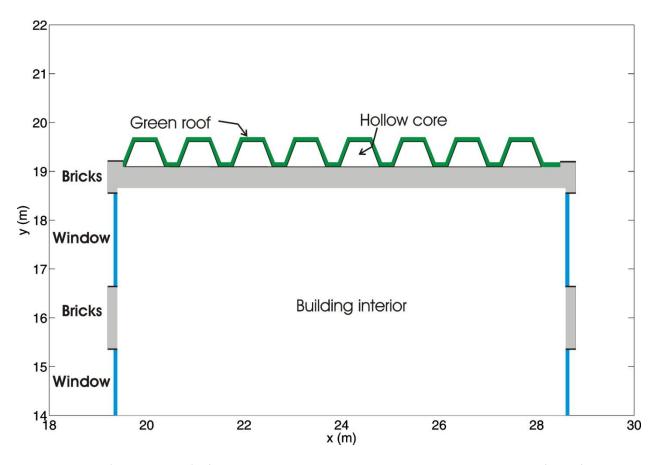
Detail (cross-section) of the central building under study, equipped with slabs of PUR foam green roof substrates on hollow trapezium cores (here, the trapezium height H equals 0.5 m).
